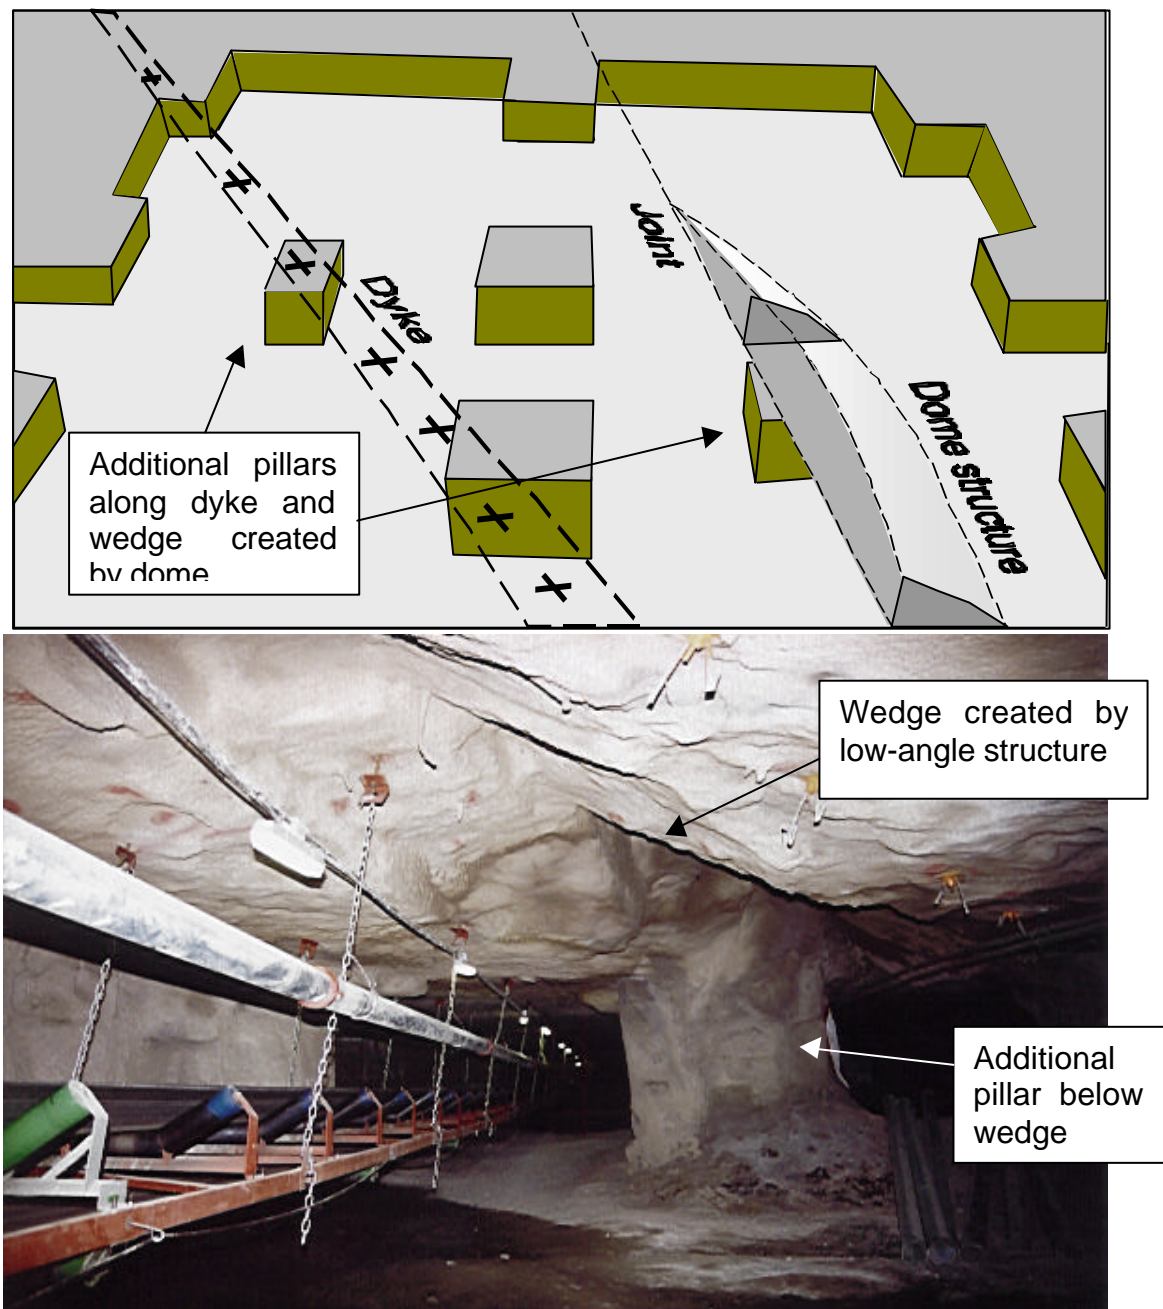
Additional pillars along structures in a shallow platinum mine using a room and pillar layout.
